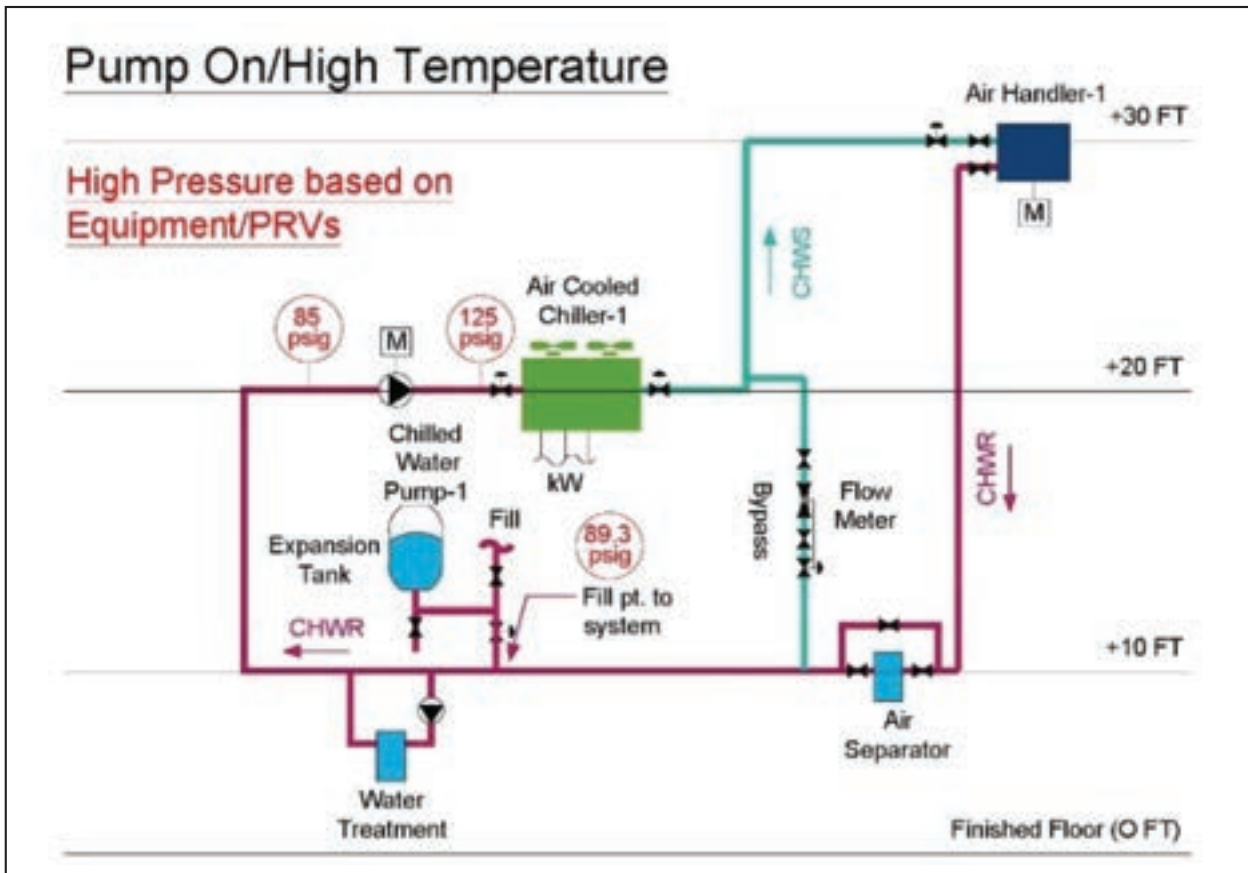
Typical arrangement of expansion tank with air separator in chilled water system
